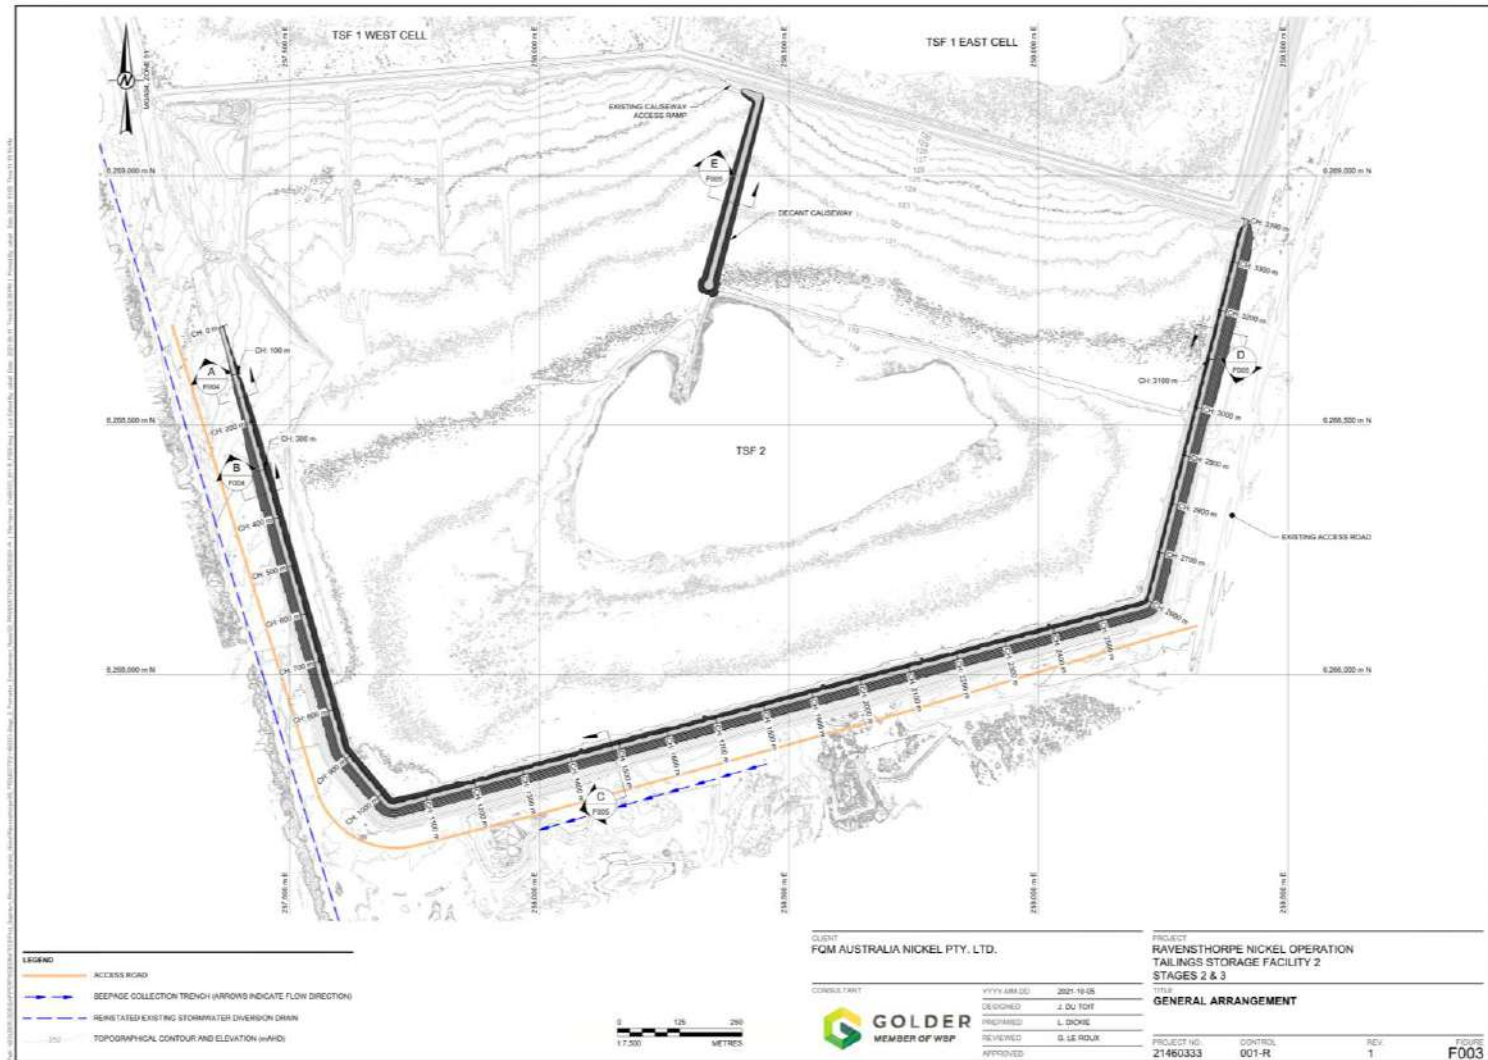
Stormwater and Seepage Management Infrastructure Plan
